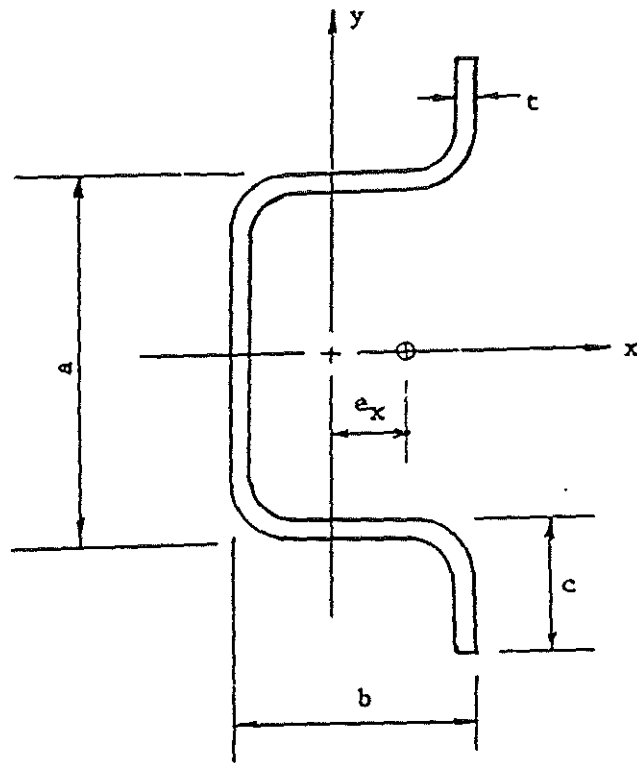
Cross Section of Hat Sections for Beam-Column Tests
